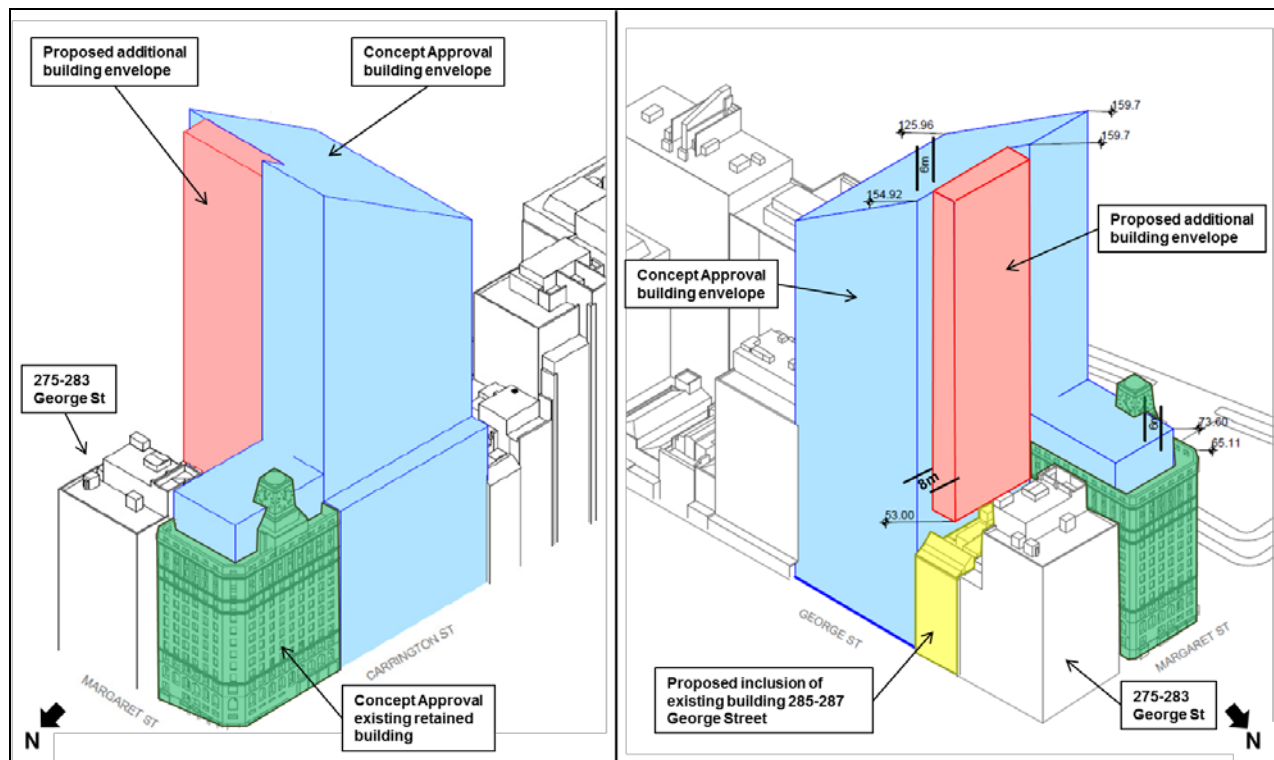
Key modifications to the Concept Approval building envelope and site boundary, additional site shown in yellow and additional building envelope shown in red (Source: Applicant's application)
